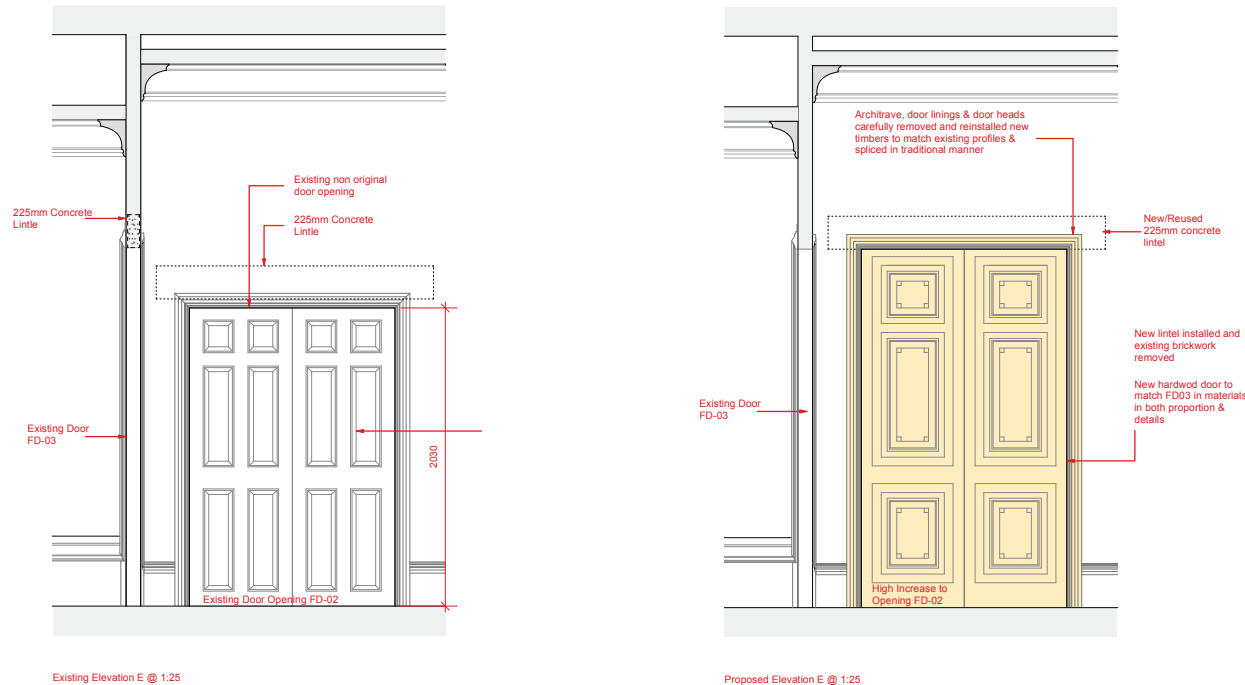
Existing/Proposed Elevation E - Flat 2, 5 Cambridge Gate
